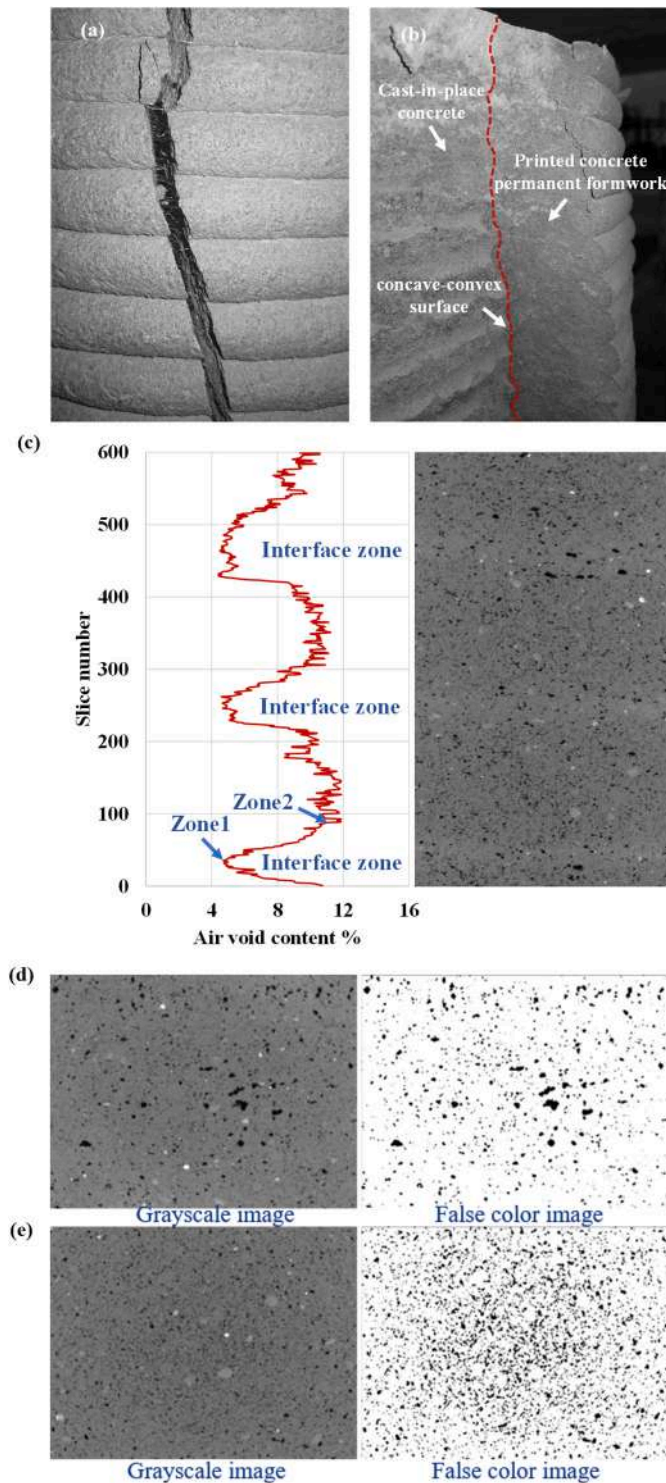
3D printed concrete as the permanent formwork of the composite column (a) Crack bridging of fibers, (b) Effect of concave-convex surface on improving bonding properties between the cast-in-place concrete and the printed concrete permanent formwork, (c) Average air void content in the height of sample, (d) The grayscale image and false color image of the inter-layer (the interface between layers) from the top view (Zone 1 in (c)), and (e) The grayscale image and false color image of the inside of the printed layer from the top view (Zone 2 in (c)). (For interpretation of the references to color in this figure legend, the reader is referred to the Web version of this article.)
